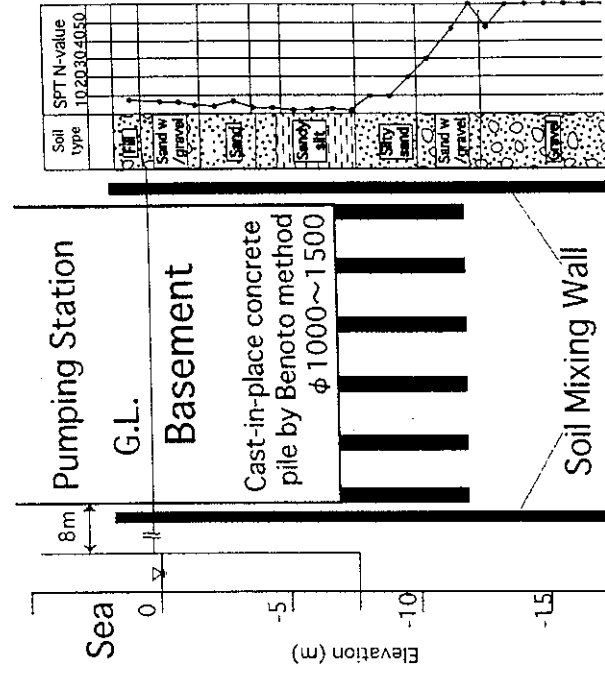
Cross-Section of Shimagami Pumping Station (Hamada and Wakamatsu 1996)
